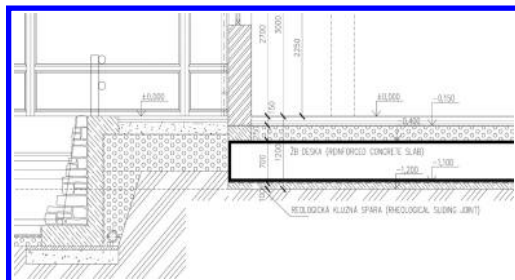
Composition of the sliding joint and cross-section of the foundation slab.
